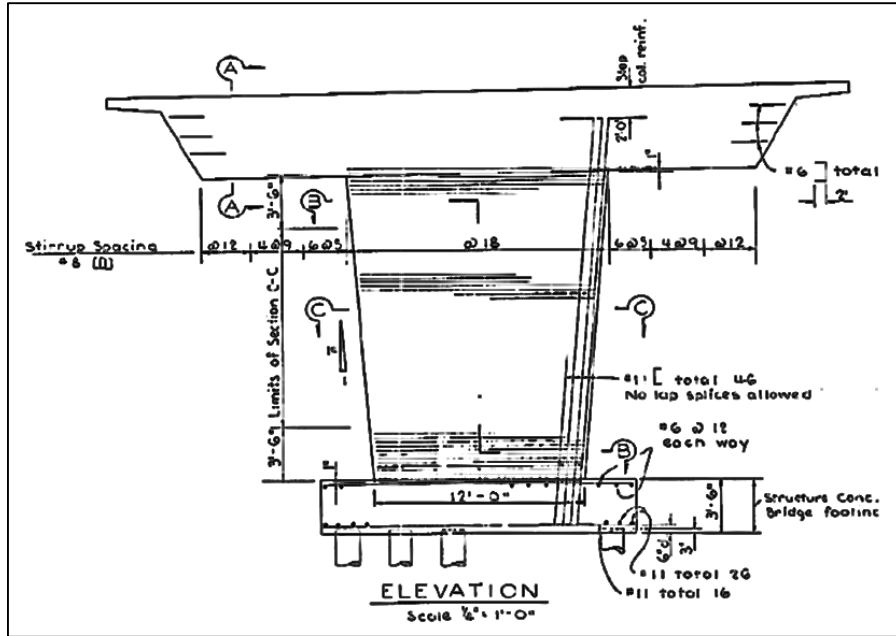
Bent Cap & Column Elevation (Hodson, 2010)
